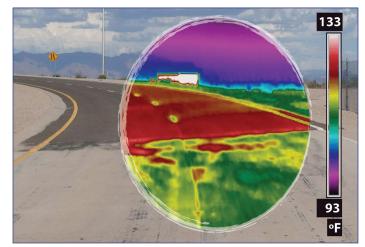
Thermal image of a pavement in Mesa, Arizona (note the temperature difference between the concrete pavement (foreground) and the asphalt pavement (background))
